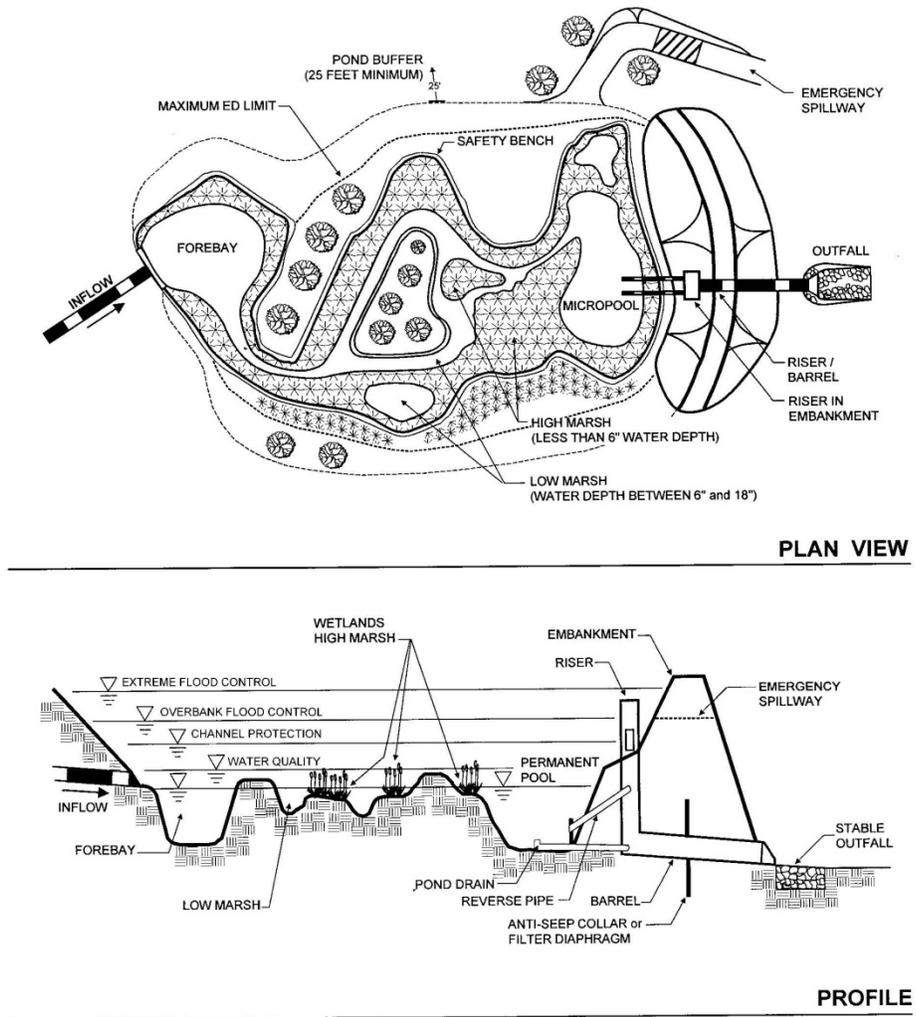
Stormwater wetland typical plan and cross-section. Source: NYS Stormwater Manual
